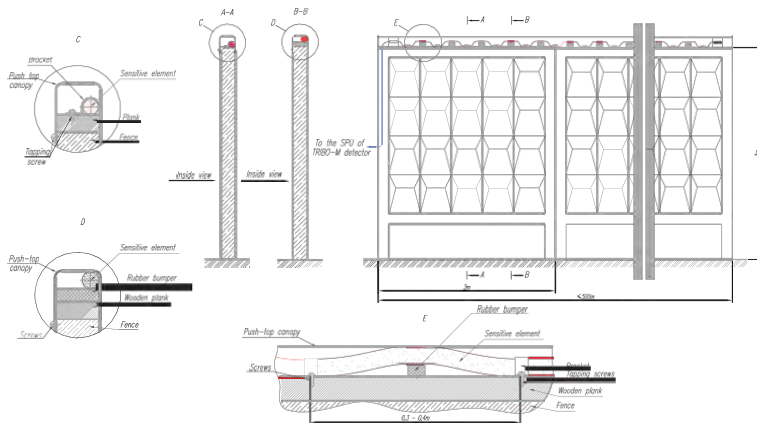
ELEMENT LAYOUT UNDER PUSH-TOP CANOPY OVER SOLID (CONCRETE) FENCE
